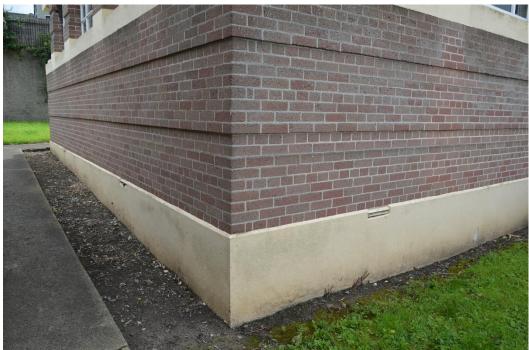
B – Front east corner detail with raised floor vents and flush struck brickwork.
